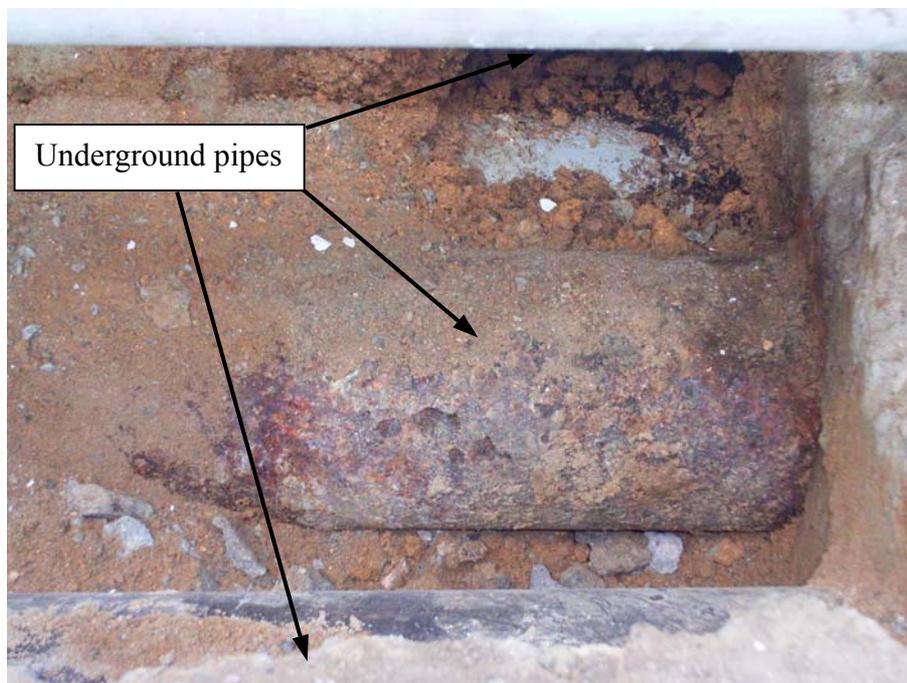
Close-up View of the Underground Pipes Exposed in Inspection Pit No. P5 Excavated
